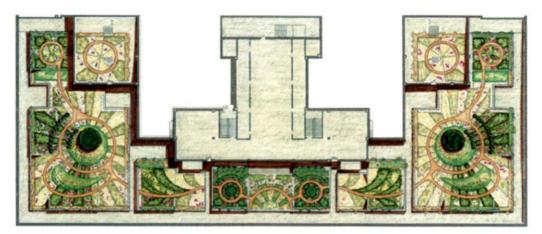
Chicago City Hall Green Roof Plan Source:http://www.asla.org/awards/2006/medals/images/da_01.jpg, 2008.
